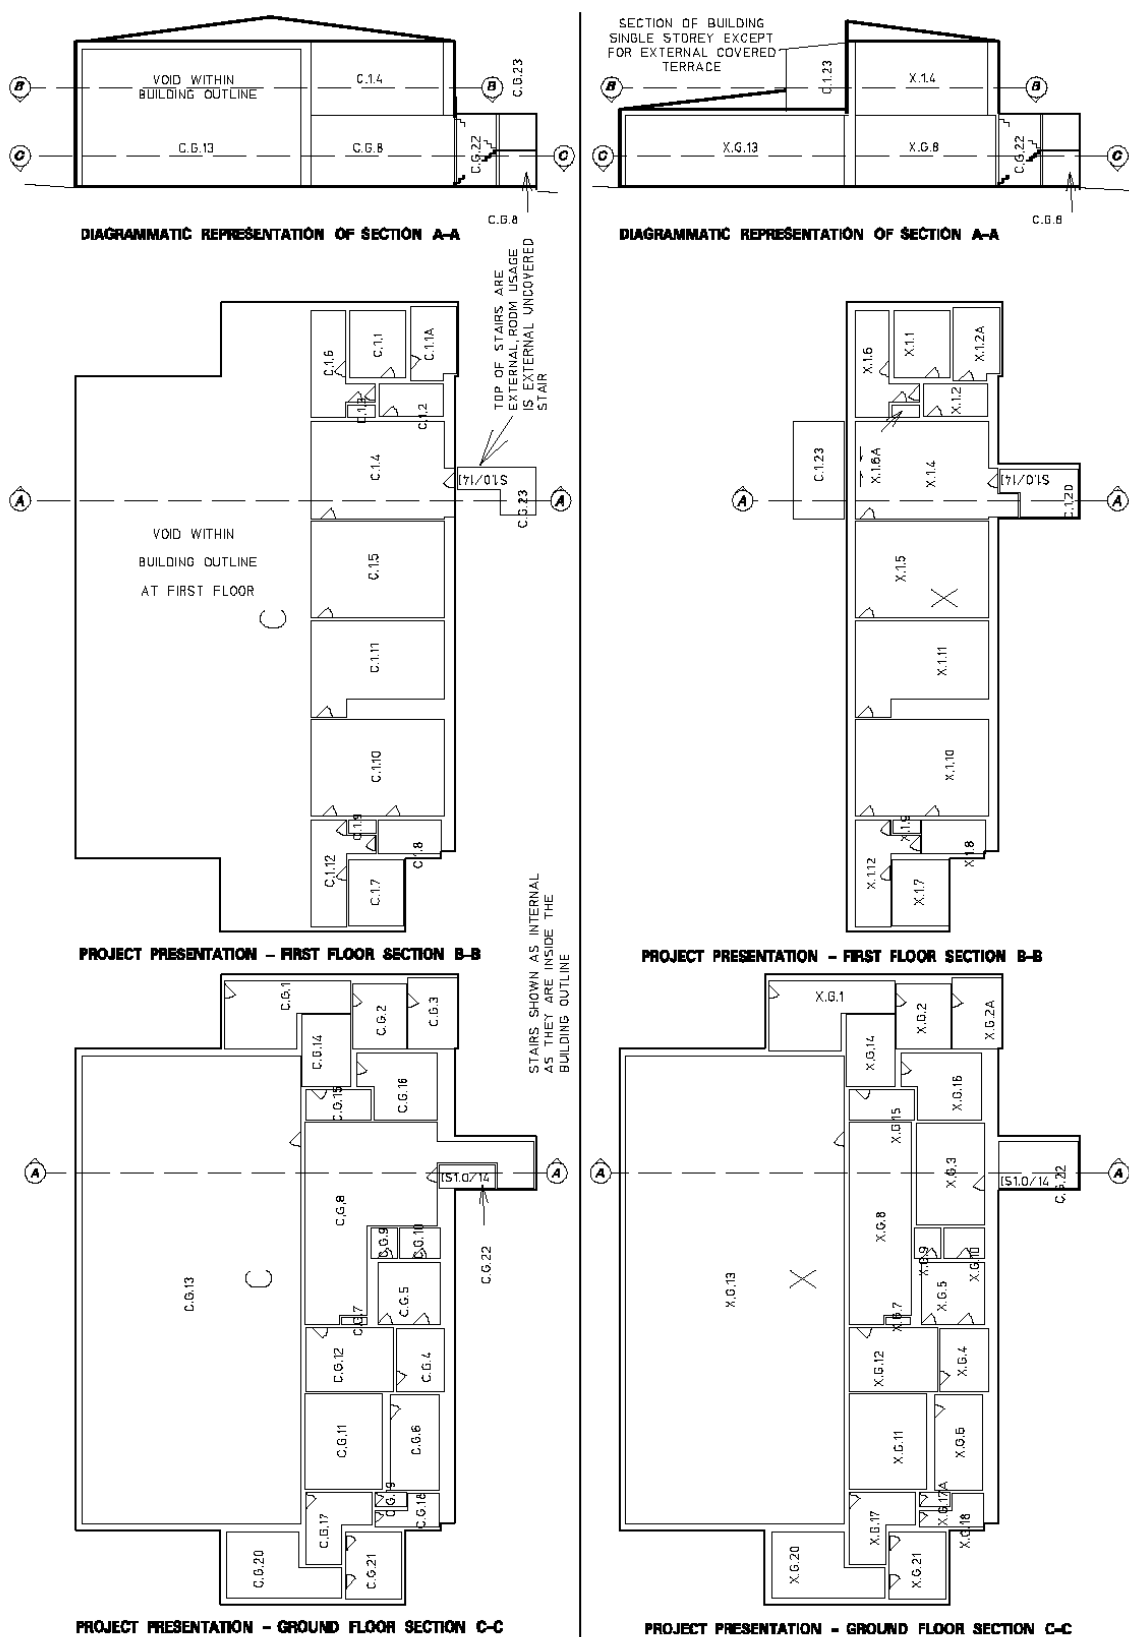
Example drawing of multiple building outlines and rooms outside building line
